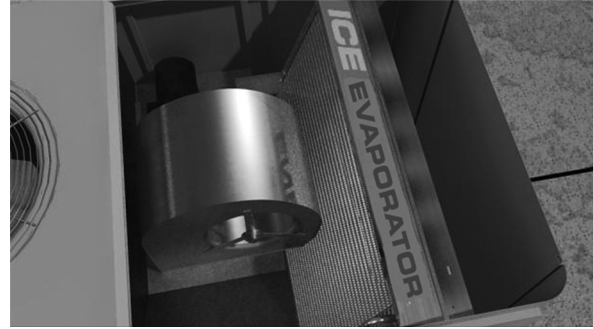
Typical view of a pumped liquid overfeed coil inserted into a packaged DX system.
